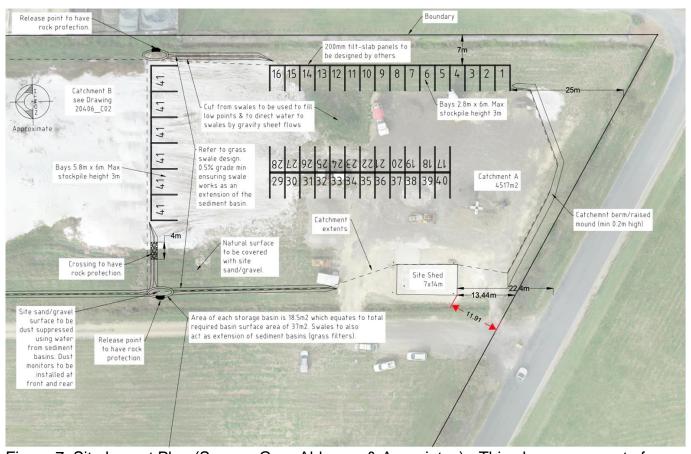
Site Layout Plan (Source: Greg Alderson & Associates) - This plan covers part of the site – refer to Figure 2 for the aerial photograph which shows the extent of the site
